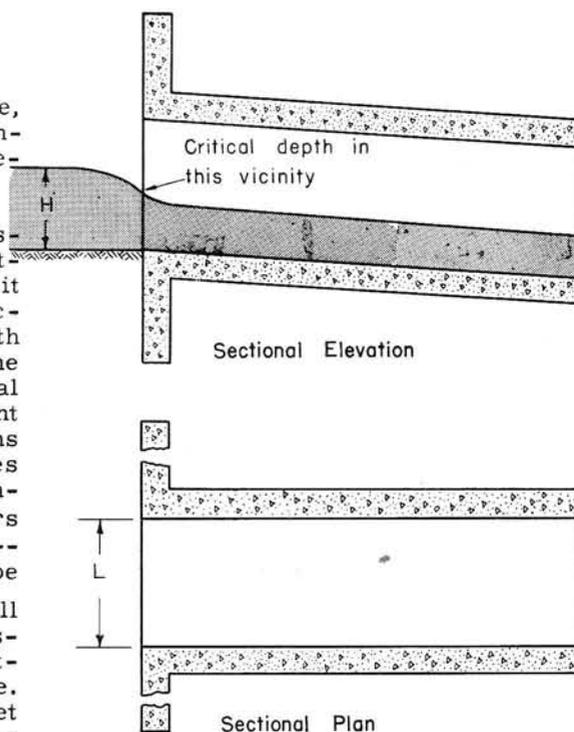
Rectangular Weir at a Box Culvert Entrance
